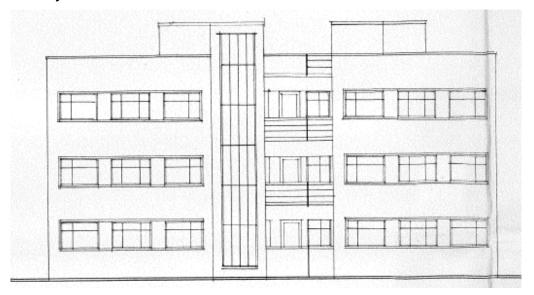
Front elevation, from plans related to Building Permit U1174 (M Benshemesh, 1951) (Source: Council Building File)
